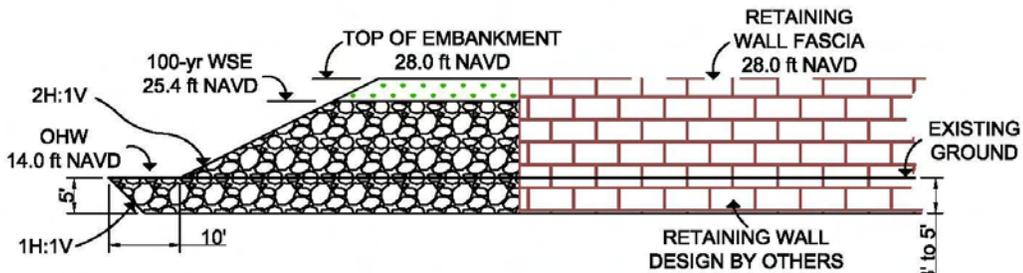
Bioengineered Shore-Protection Structure Detail with MSE Retaining Wall Set Back from Property Line – Northwest Corner
